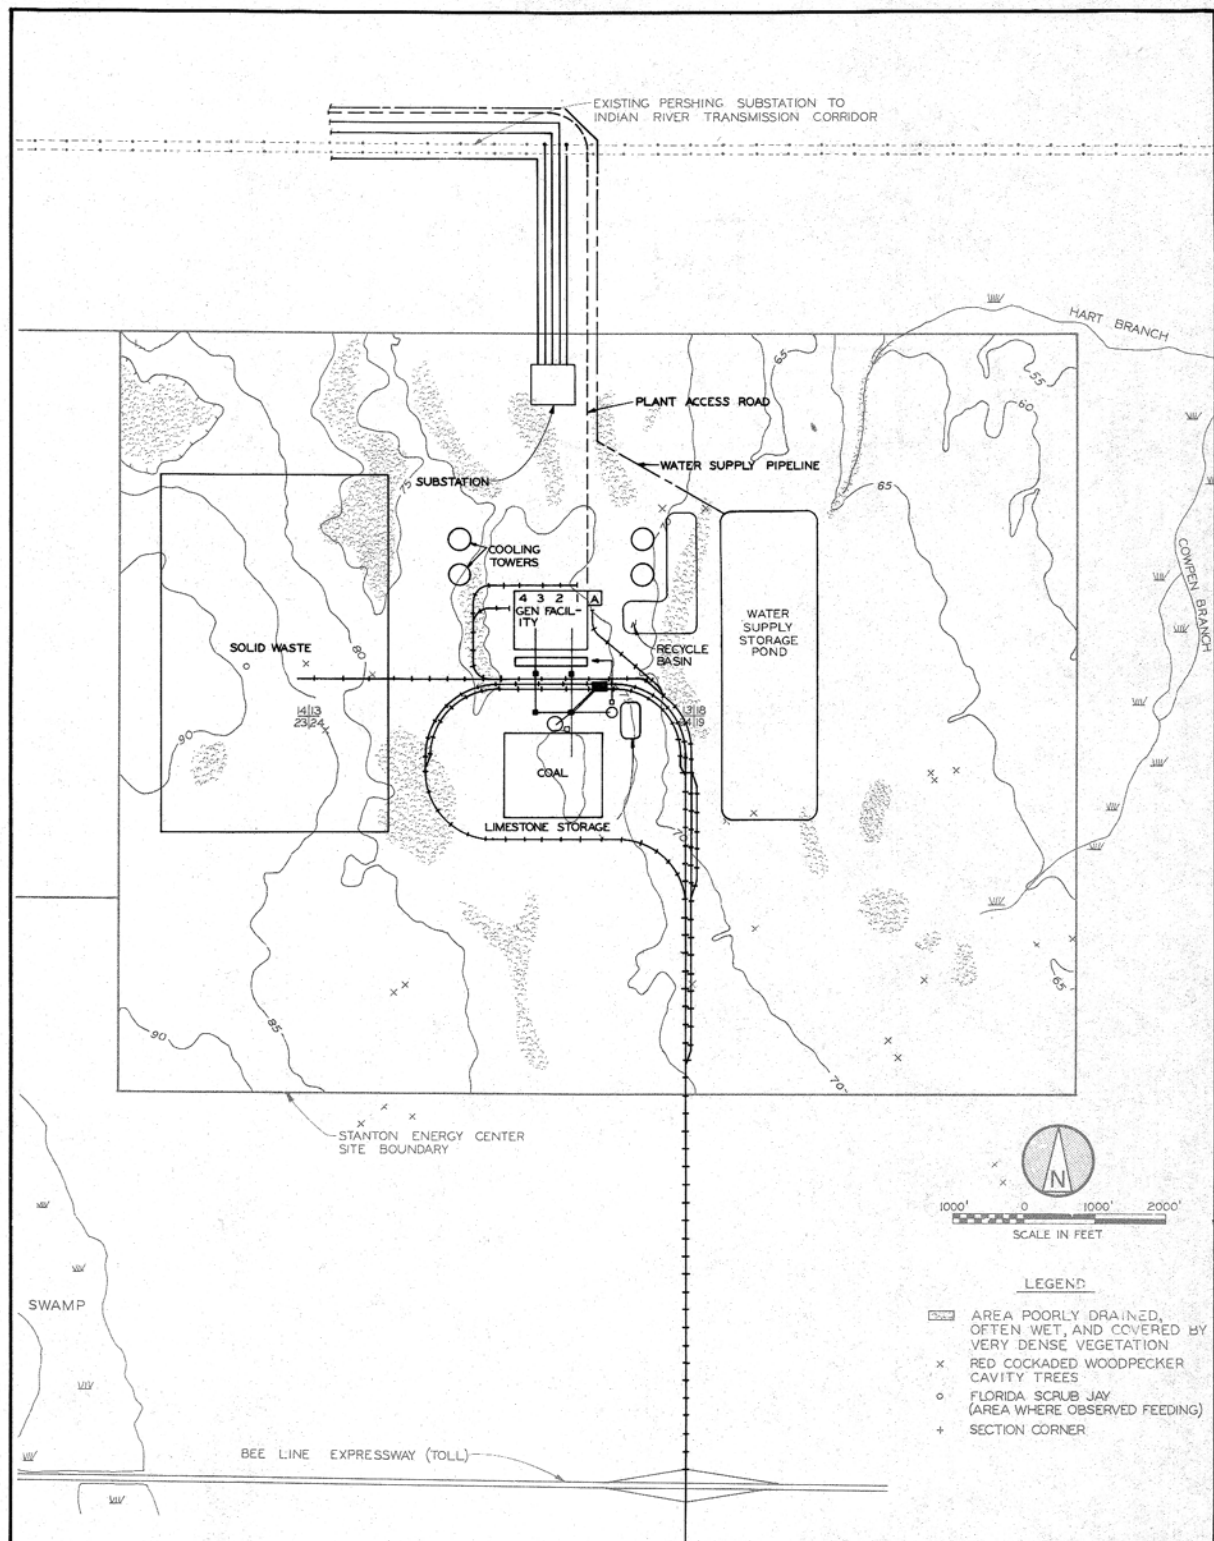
SITE ARRANGEMENT-PLAN A
